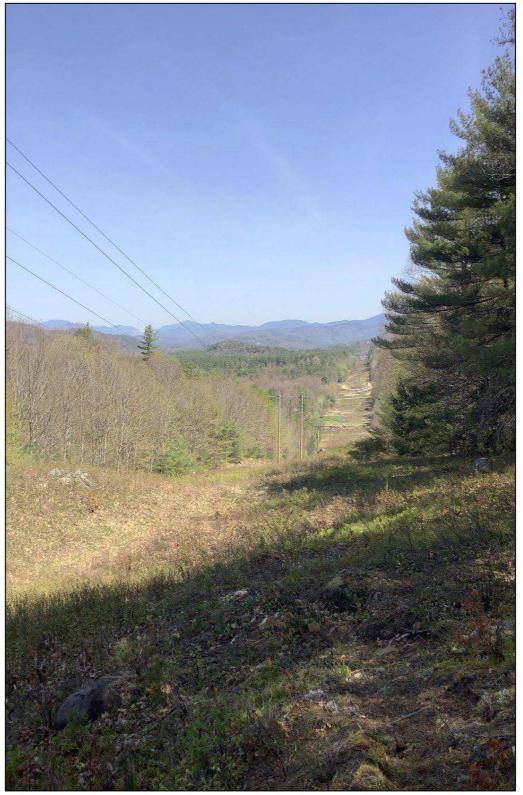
View north near Structure 285 looking down slope towards Structure 286.
